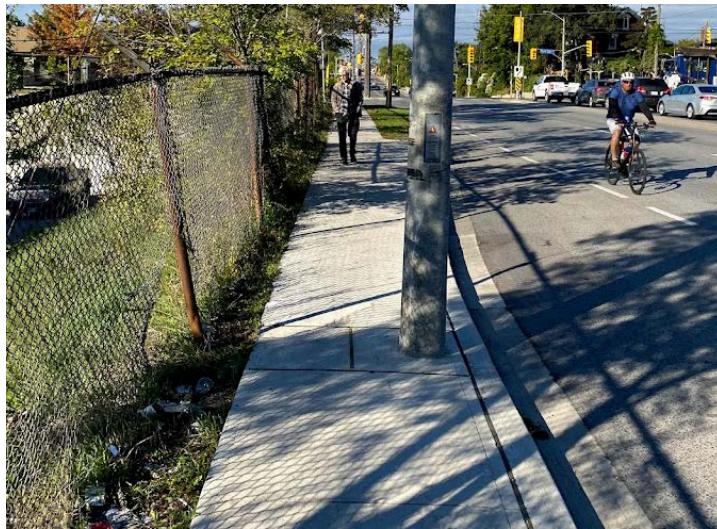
Sidewalks in certain sections of The Queensway are below accessibility standards. This photo is from a location where due to a fence and a utility pole, there is only a 1.0 metre wide sidewalk.
